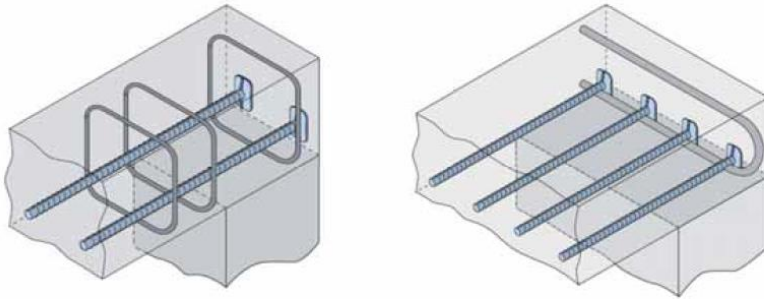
Type 1 stud connectors in reinforced concrete slabs and beams
